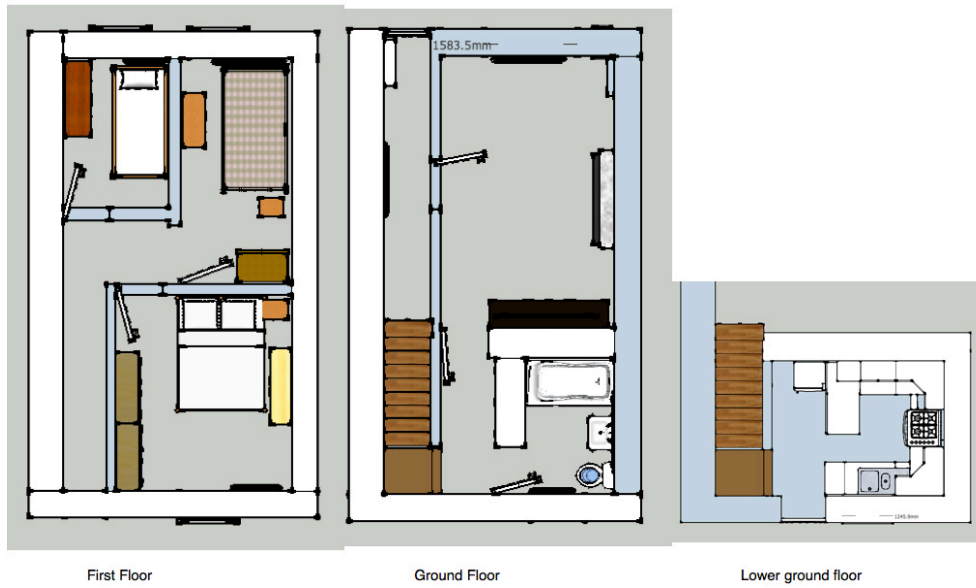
Room plans of dwelling 4, first, ground and lower ground floor.
